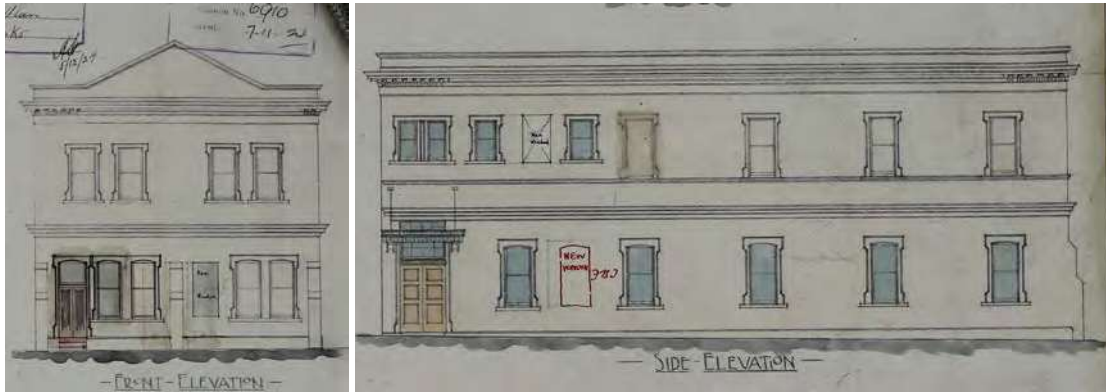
Elevations of Fernshaw House, prepared by architects H W & F B Tompkins, 1924. The Canning Street elevation (left) shows the earlier presentation of the building
